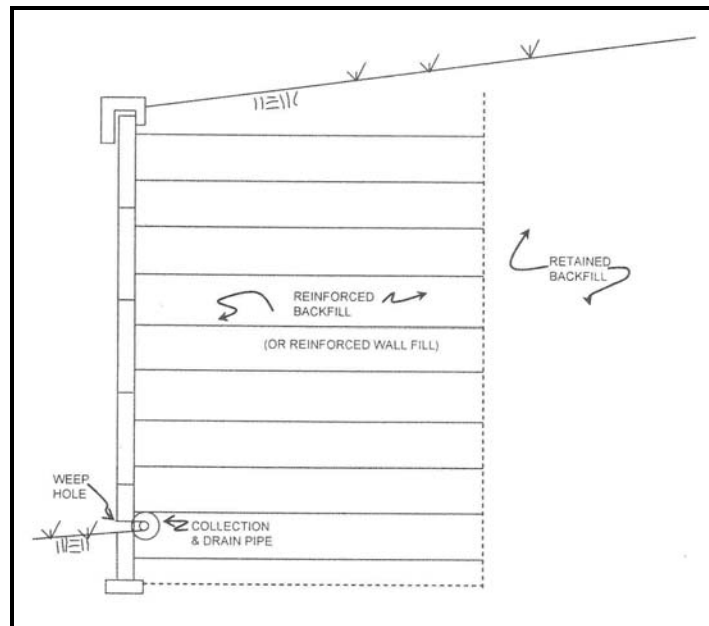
, Drain Immediately Behind MSE Wall Face (Earth Retaining Structures – June 2008)
